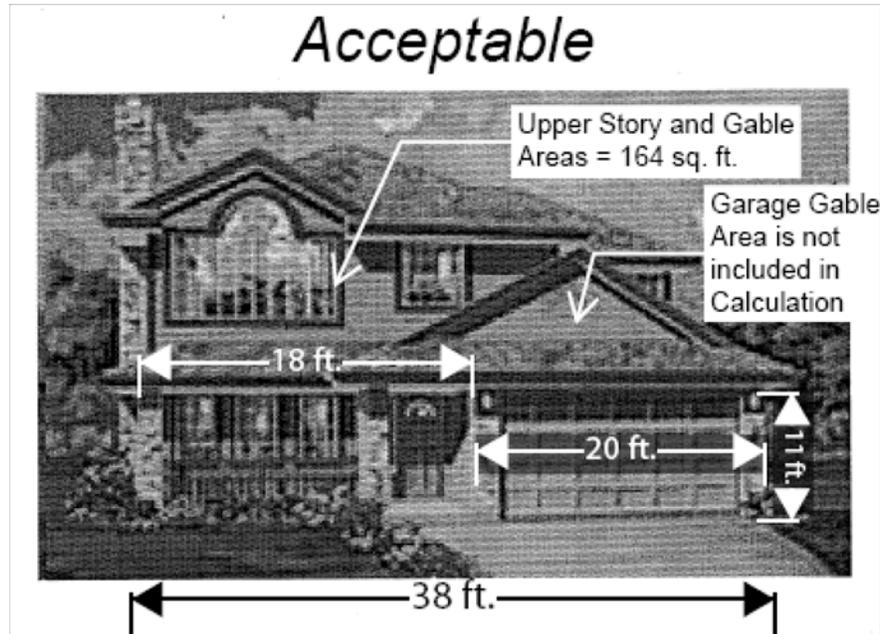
B - Acceptable Street-facing Garage Facade Area
